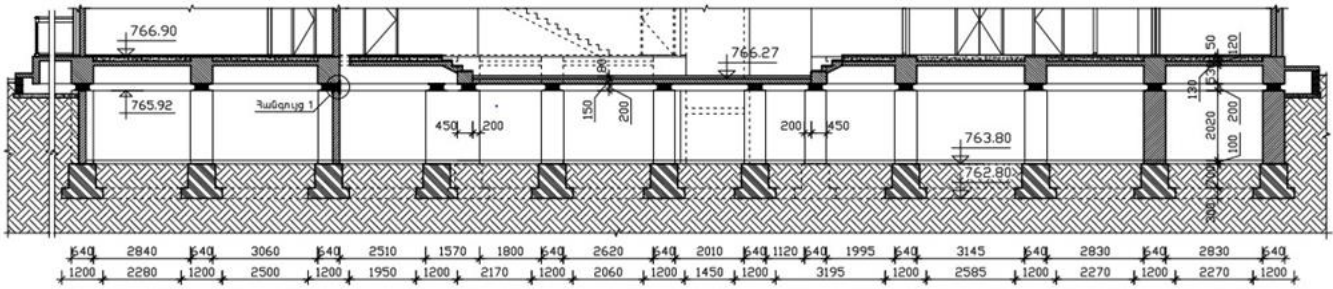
Vertical elevation of the building's seismic isolation system in one of longitudinal directions of the 7-story apartment building "Stepanakert-Sections-4-5" with R/C monolithic load-bearing walls
